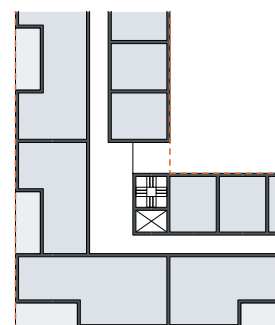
F.2 Alternatives to respond to built form corners, location of access cores, building separation and apartment configuration
